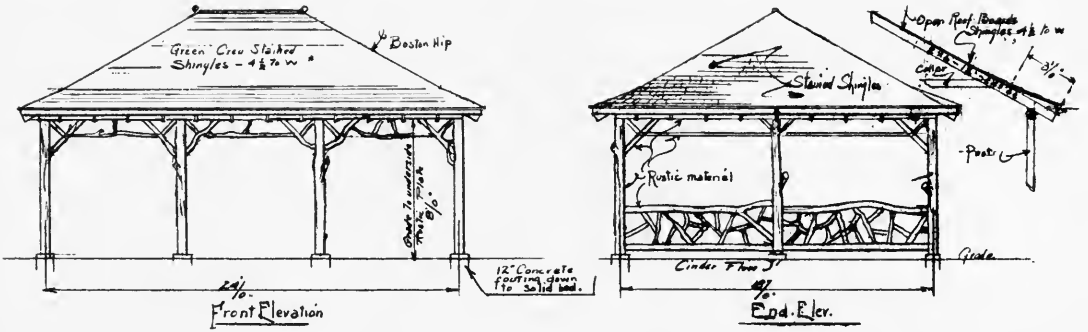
PLANS OF SHELTER SHOWN IN PLATE 187
